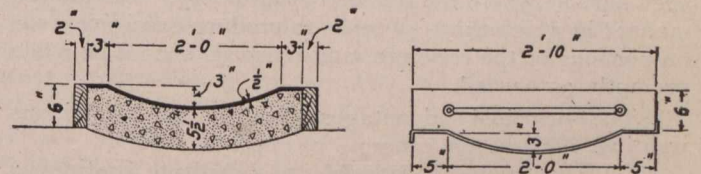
Typical Cross-section of Concrete Gutter and Design for a Template to be Used in Its Construction.
